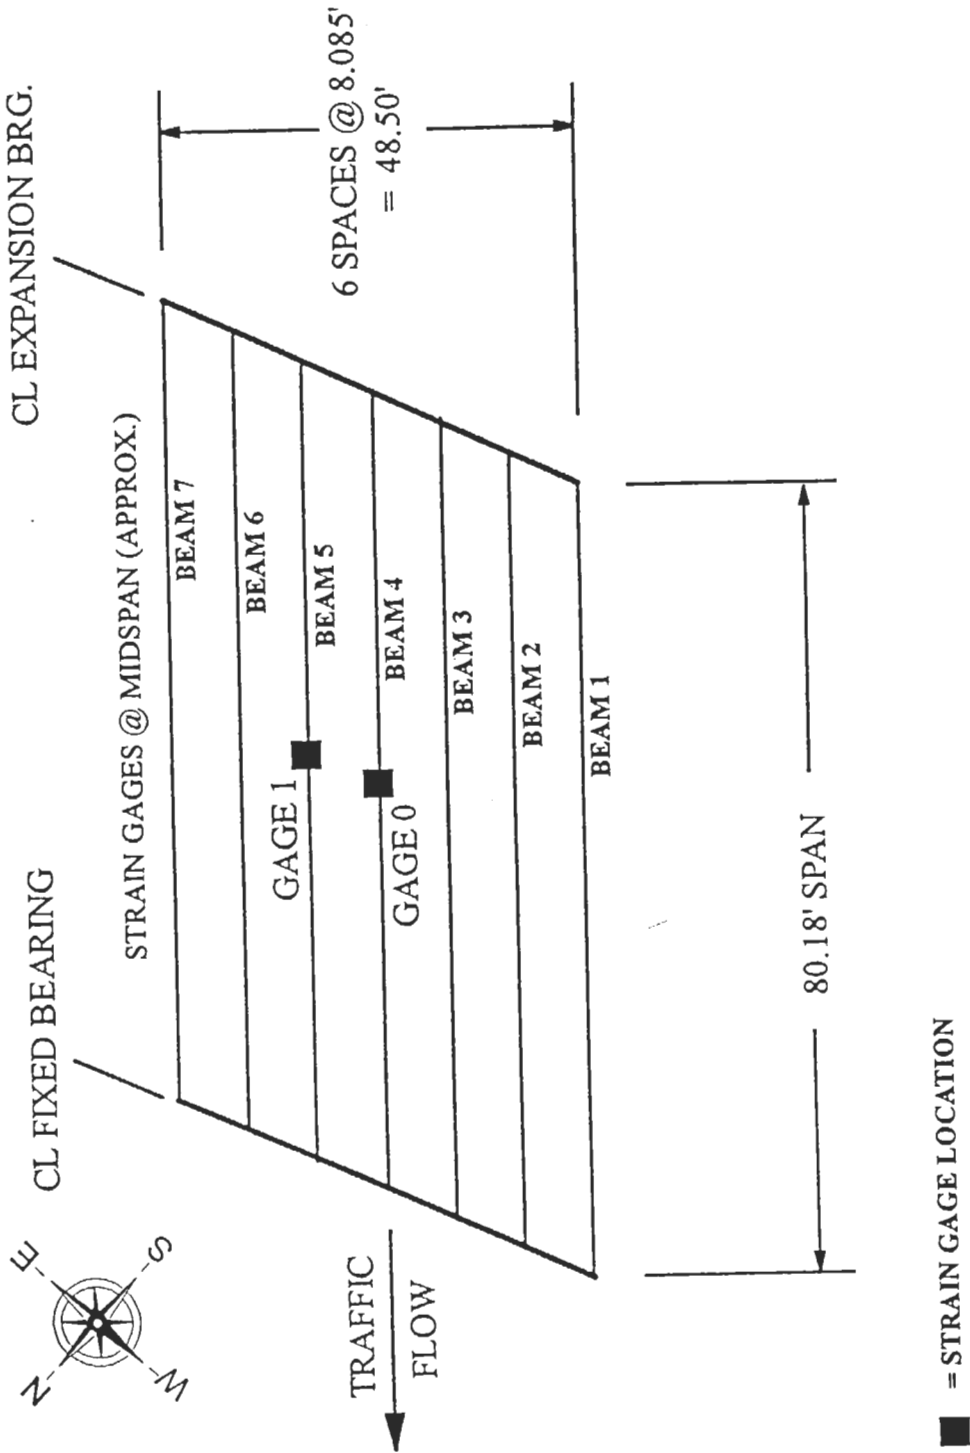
Route 8 Bridge - Plan View With Strain Gage Locations
